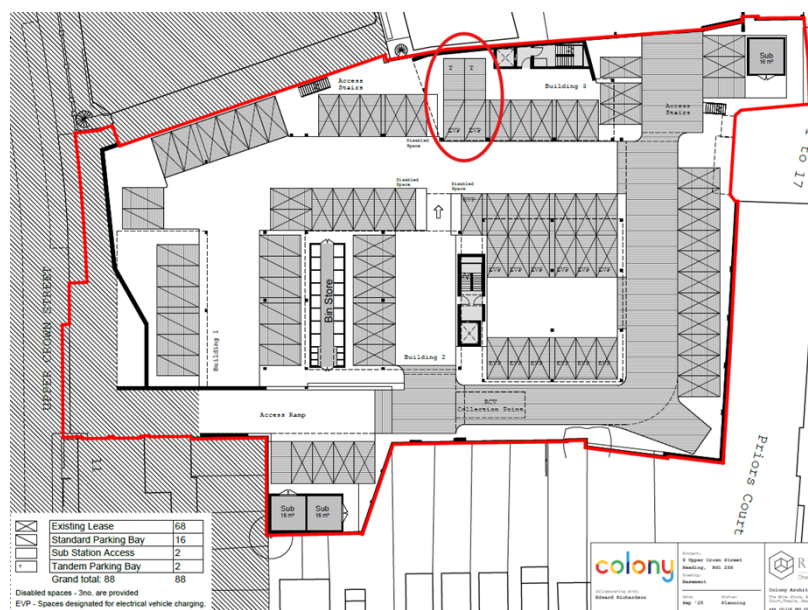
Basement Level Car Parking Plan as Proposed (additional spaces circled red)
